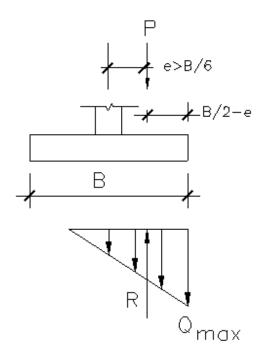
Footing pressure with eccentricity greater than 1/6 footing width
